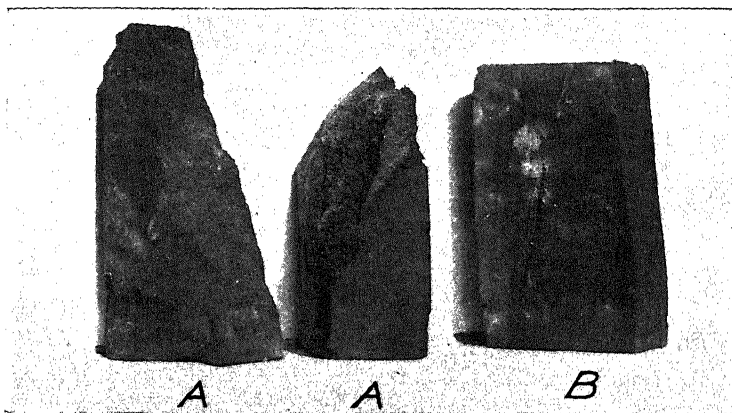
A. TYPICAL FAILURE OF BRICK A IN LOAD TEST. B. FAILURE OF BRICK B IN LOAD TEST. ORIGINAL DIMENSIONS 8.75 IN. BY 4.13 IN. BY 2.53 IN.; FINAL DIMENSIONS, 7.66 IN. BY 4.31 IN. BY 2.72 IN.
